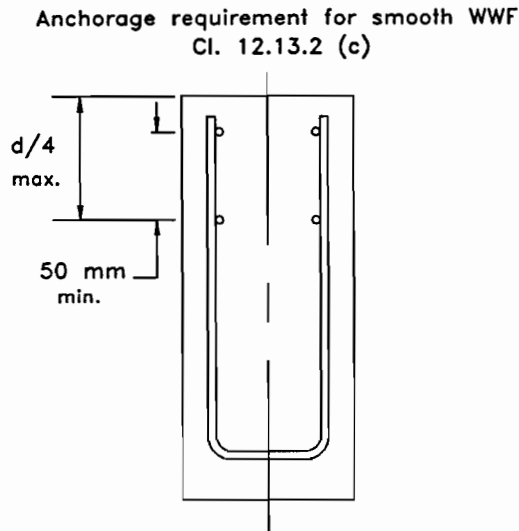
Anchorage requirements for smooth welded-wire fabric U-shape stirrups
